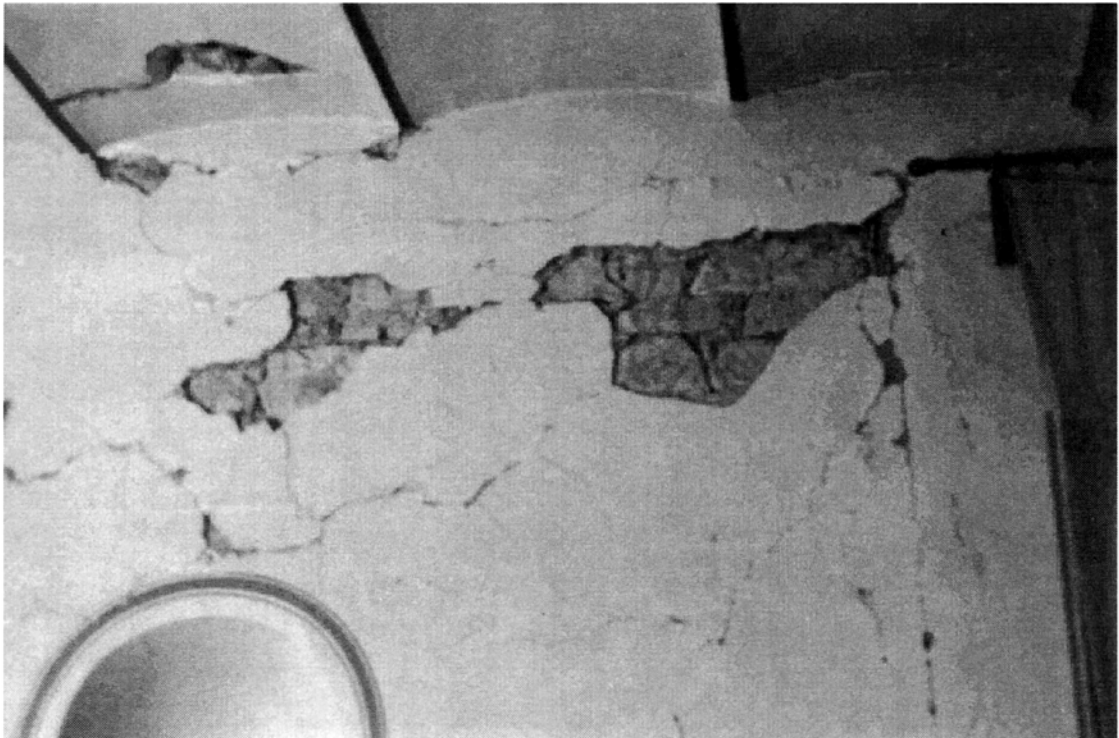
Santa Chiara Convent: traditional floor structure in the refectory
